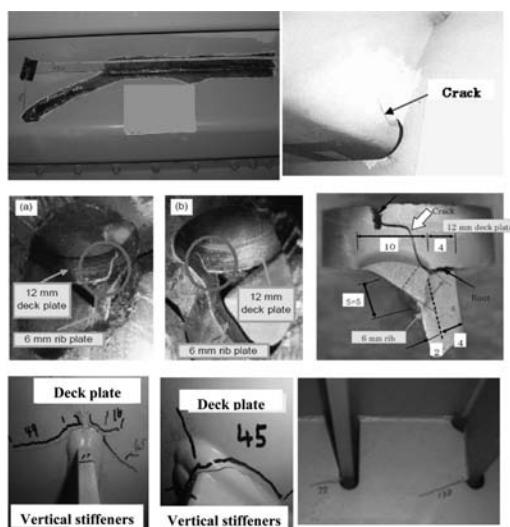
Fatigue cracks on orthotropic steel deck.
